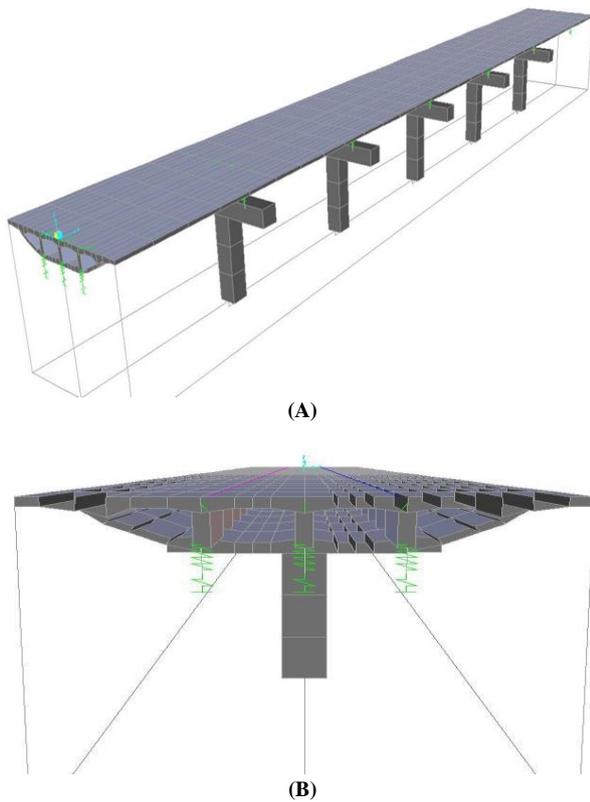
Continuous Box Girder Concrete Bridge Model: (A) Longitudinal Section, (B) Transverse Section.
